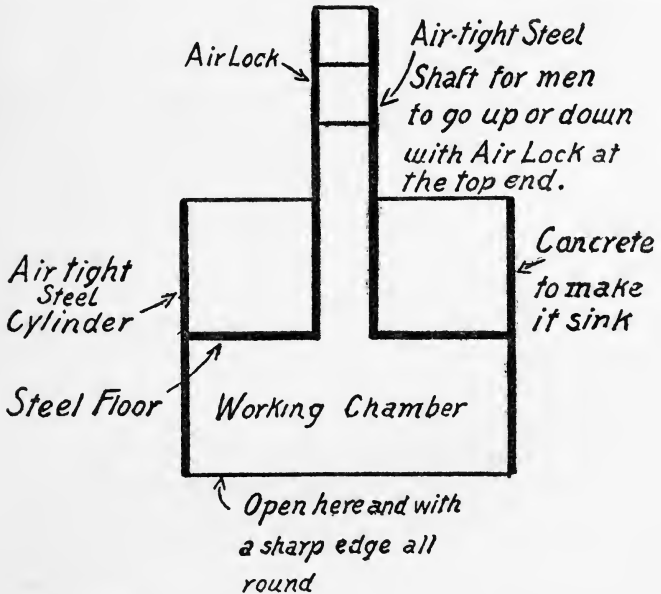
Diagram showing construction of a Caisson, for building foundations in deep water.
